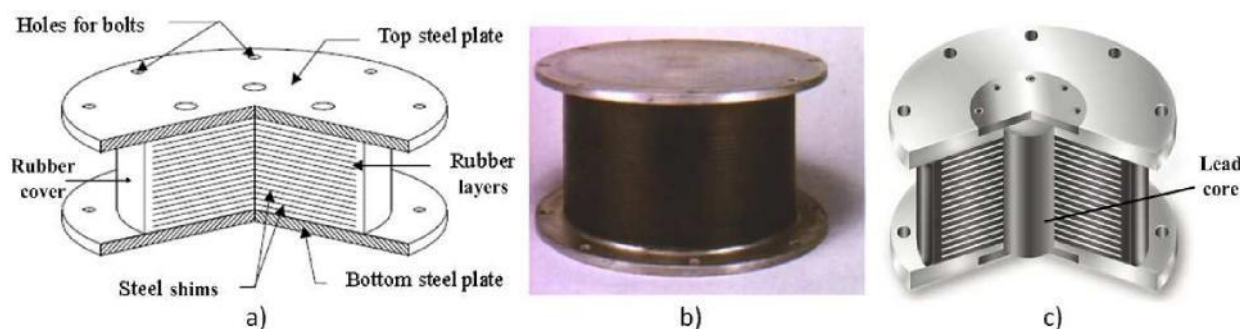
Elastomeric bearings: a) Natural Rubber Bearing (NRB), b) elastomeric bearing device, c) Lead Rubber Bearing (LRB)
